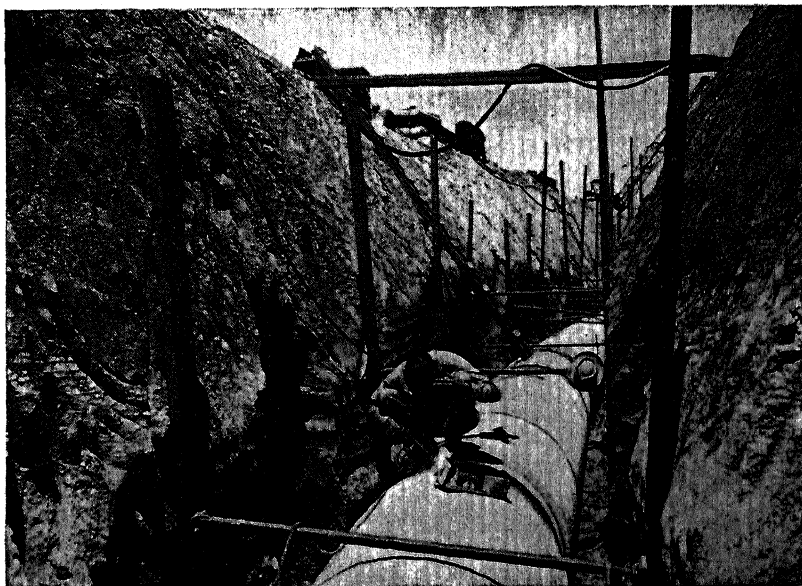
Welding on the outside seam of a ball and spigot joint in a 51-inch feeder line of the Colorado River aqueduct system. This line has a heavy protective layer of reinforced concrete outside and inside. The girth joints are also welded on the inside. Fabrication of this pipe is illustrated in Figs. 1321 and 1322.
